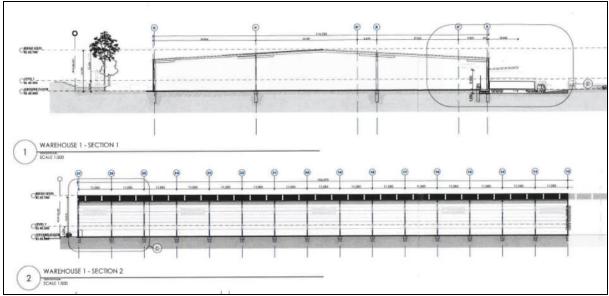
Extract of the approved Elevations of Warehouse 1 under DA-594/2013
